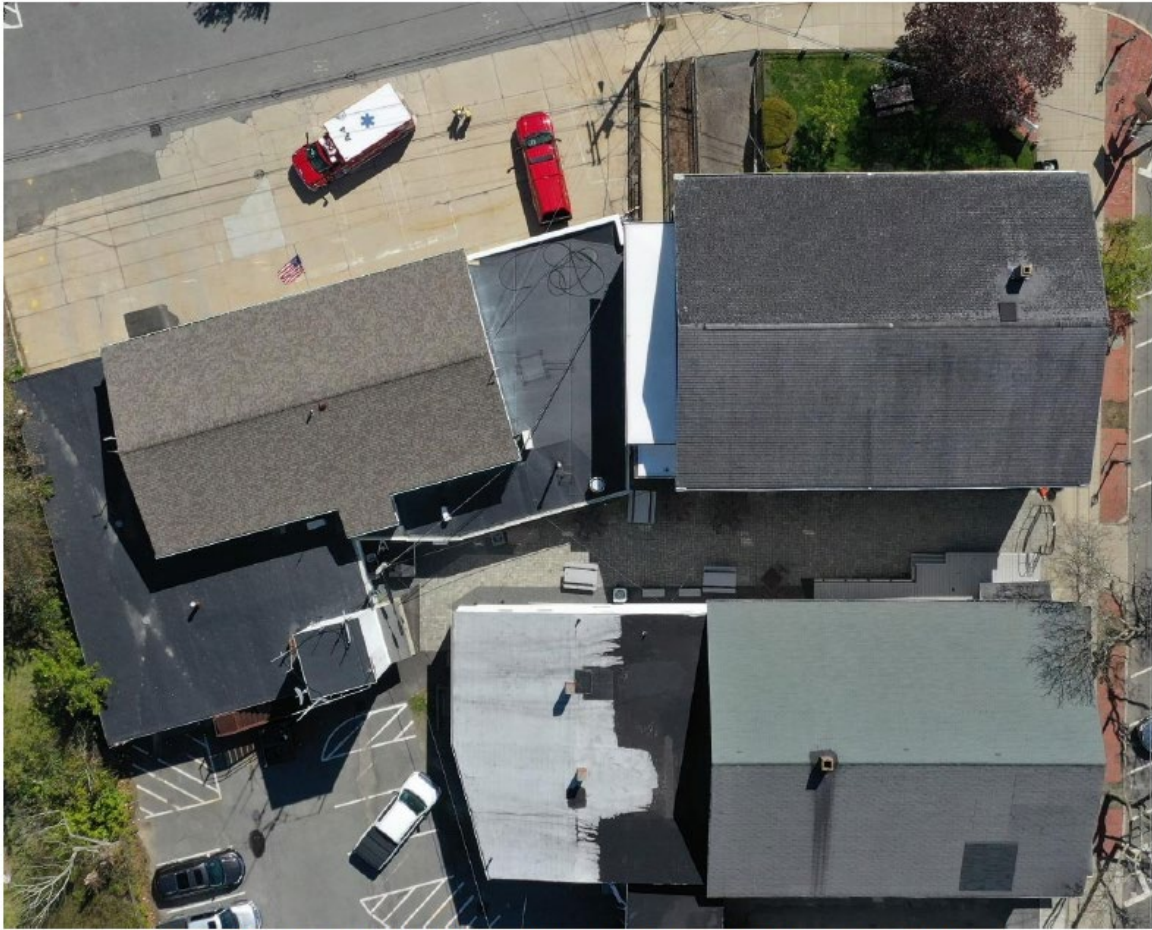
Aerial Plan View of Town Hall and Adjacent Buildings.
